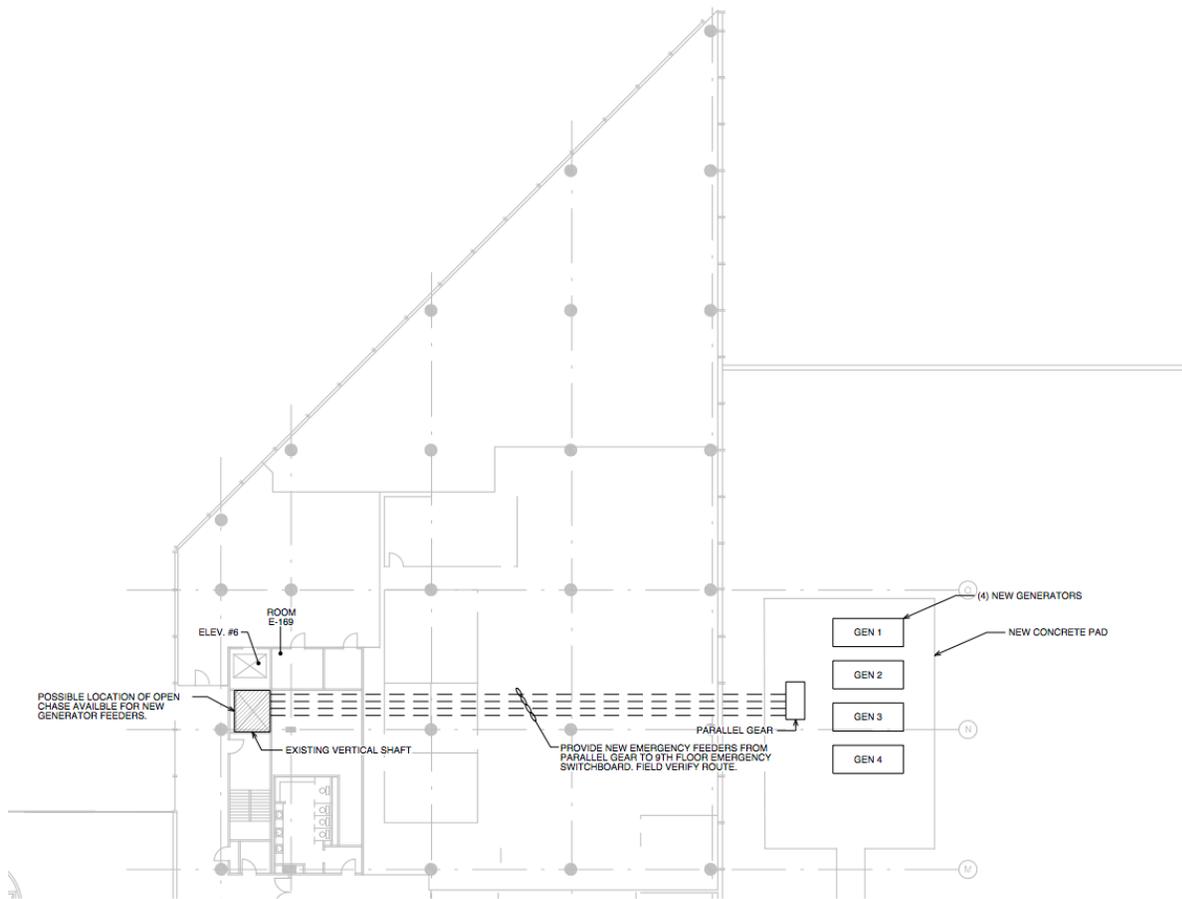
Proposed generator equipment arrangement on roof of Parking Garage
